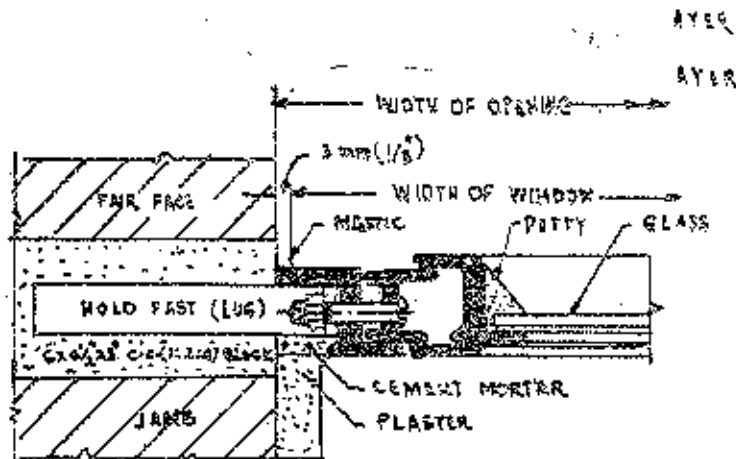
(f) MASONRY OPENINGS WITHOUT PLASTER.
